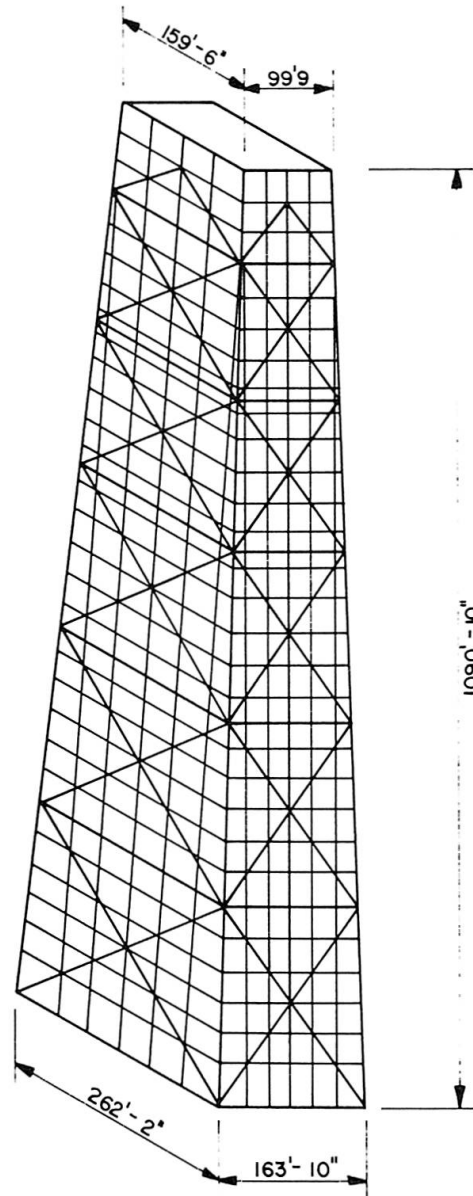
Diagonally braced truss tube structure from bottom to top of building
